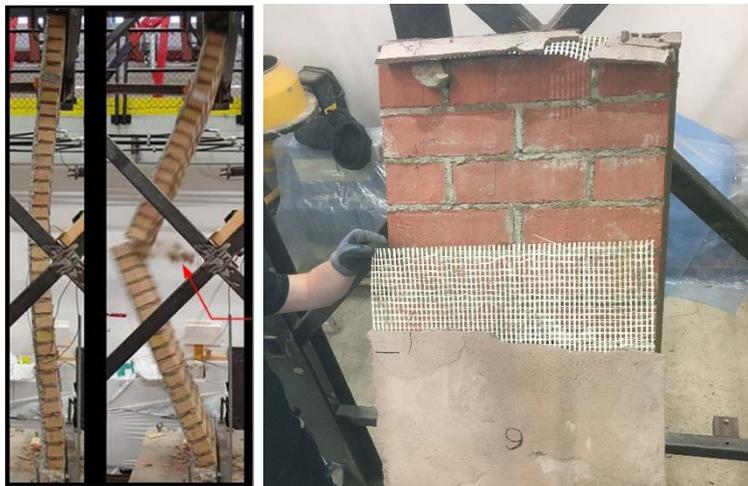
Failure in glass fibre mesh strengthening. Tensile failure of the glass fibres triggers collapse of the wall (left); bond failure in the overlap zone between to pieces of glass fibre mesh (right).
